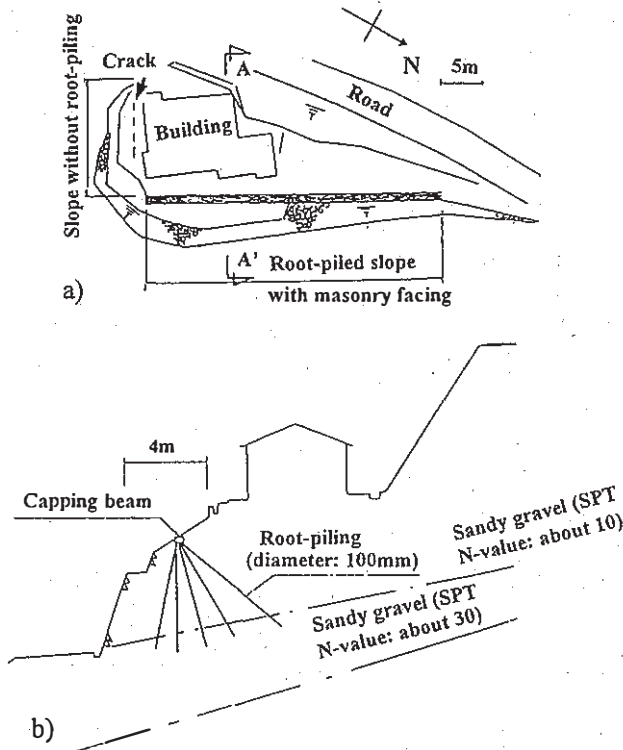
a) Plan of the root-piled slope and adjacent damaged unreinforced slopes and b) cross-section A-A' of the root-piled slope near Takarazuka (RP2 in Fig. 3; after Fujii et al., 1996).
